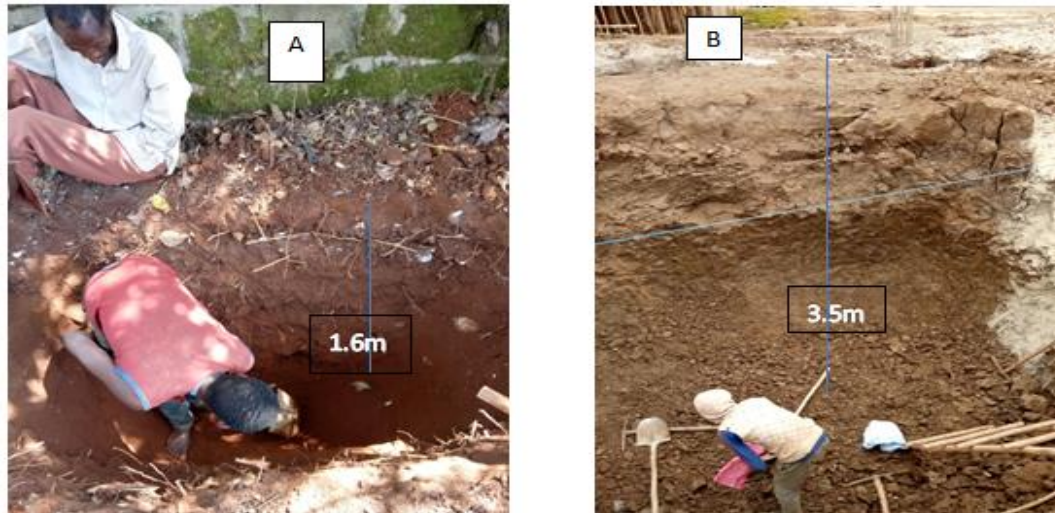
Soil sampling A) Test pit excavation at GPS reading (long. 436038 m lati. 436038). B, from foundation excavation at YAIP, GPS reading (long. 429734 m, lati. 745720 m)
